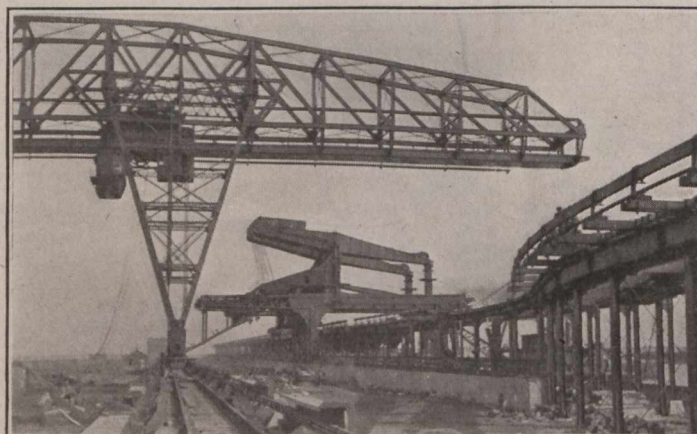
New C.P.R. Coal Handling Plant on Island no. 1.
